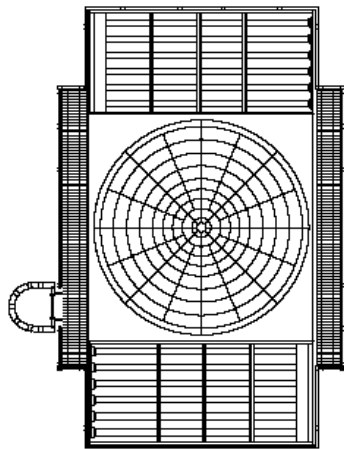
TL1CRR External Motor Gear Drive Platform Ladder Safety Cage Installation
